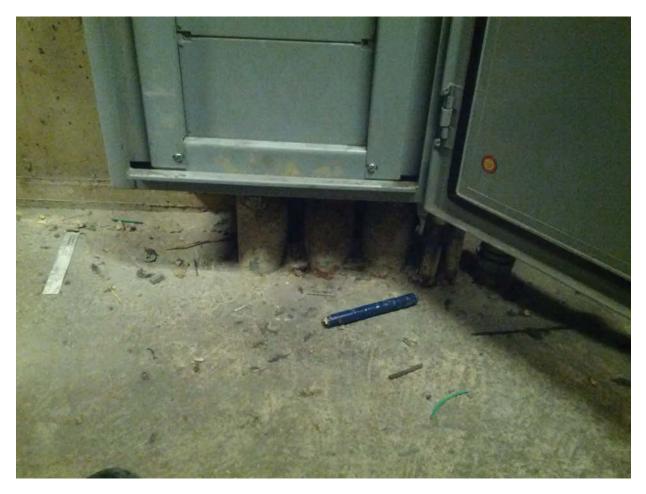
E03 U Street West - AFC Panel WF in Room 212
